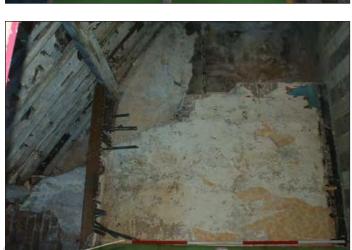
(Above Left) Room 3 Roof Space Showing Rope and Plaster Division
